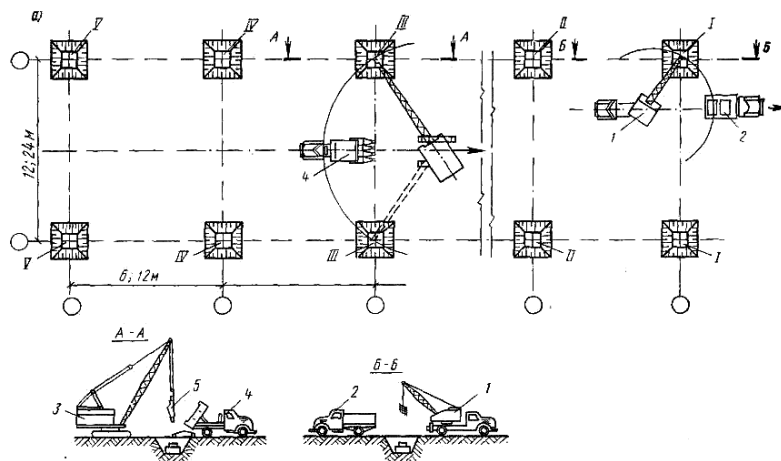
Scheme of the technological process for the installation of monolithic reinforced concrete foundations using cranes
